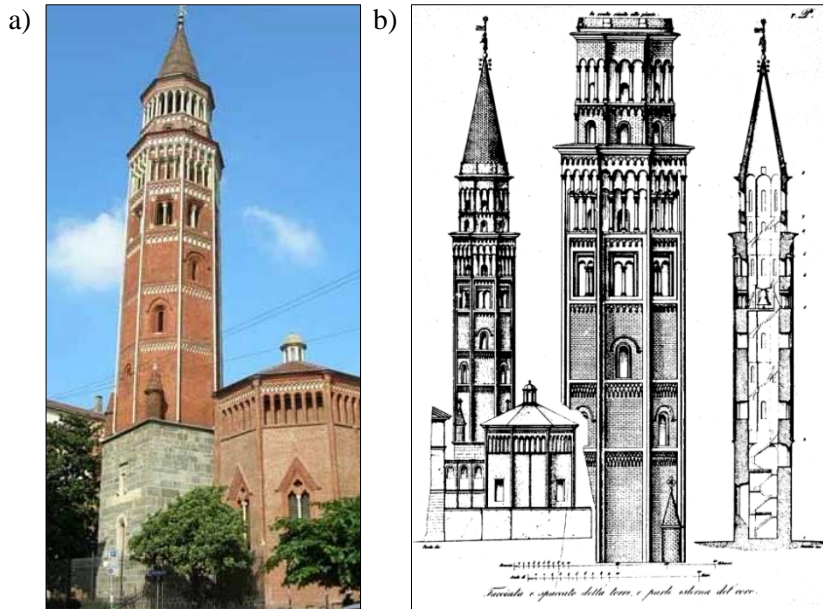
Bell-tower of the church of San Gottardo in Corte, Milan: (a) view of the bell-tower and the San Gottardo in Corte Church and (b) ancient drawings of the building.
